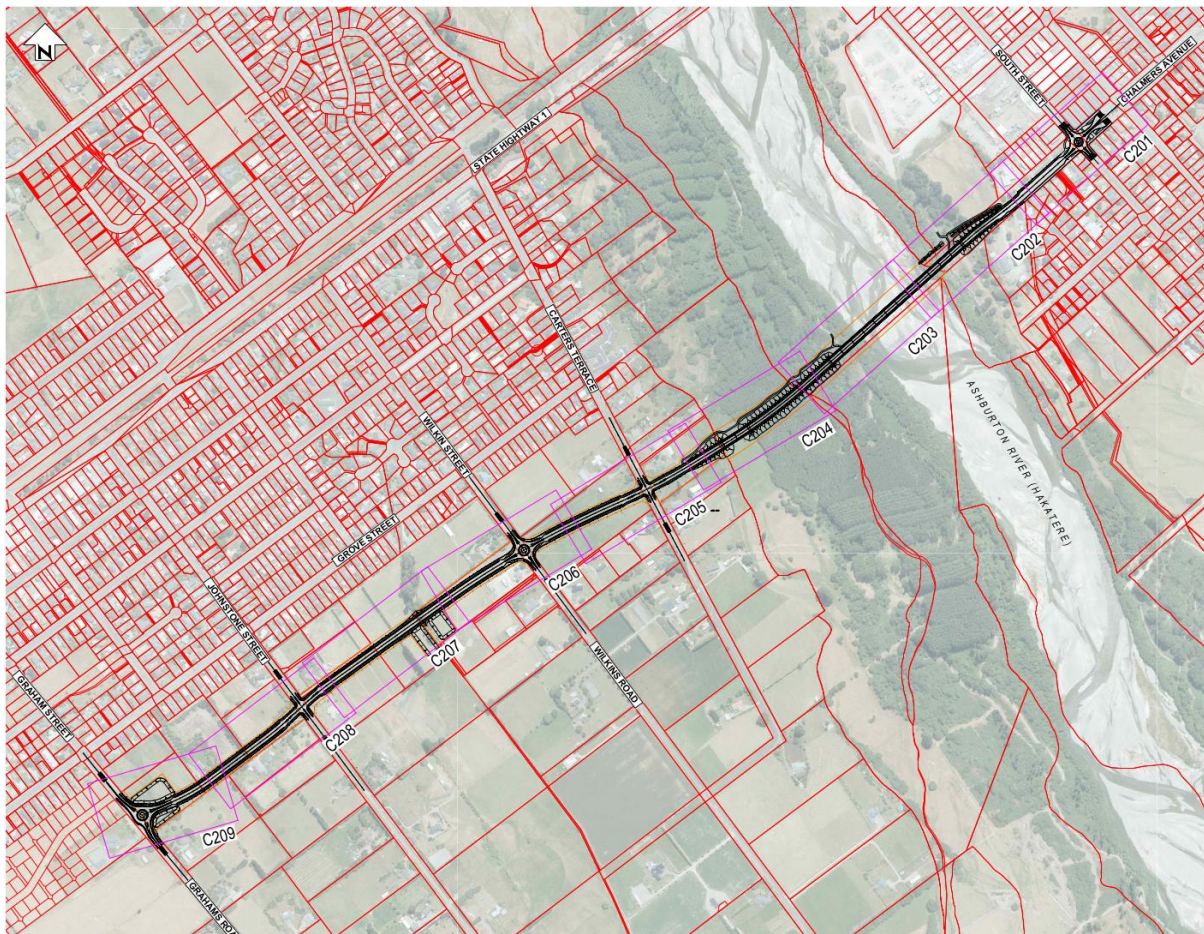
10 Proposed Second Bridge Crossing Site-Layout
